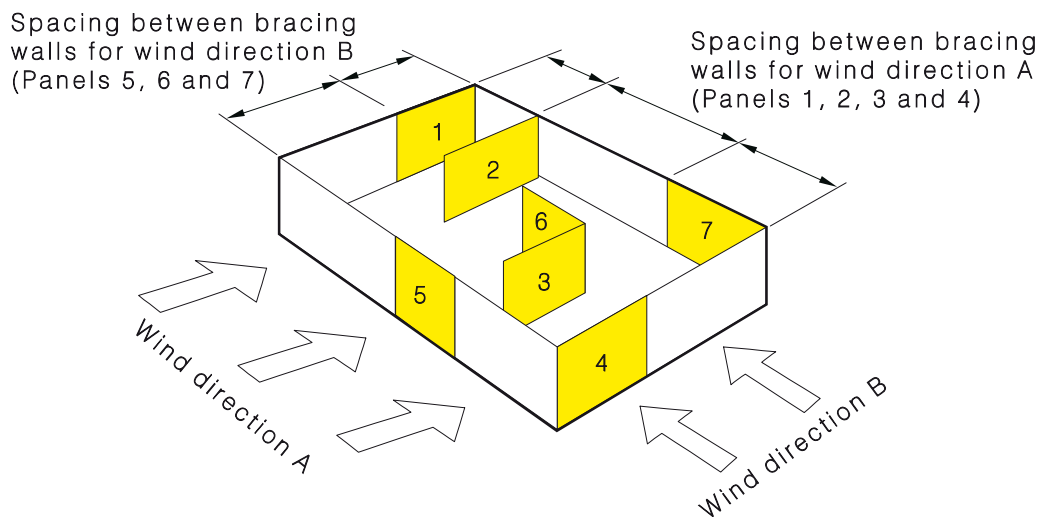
DISTRIBUTION OF WALL BRACING UNITS
